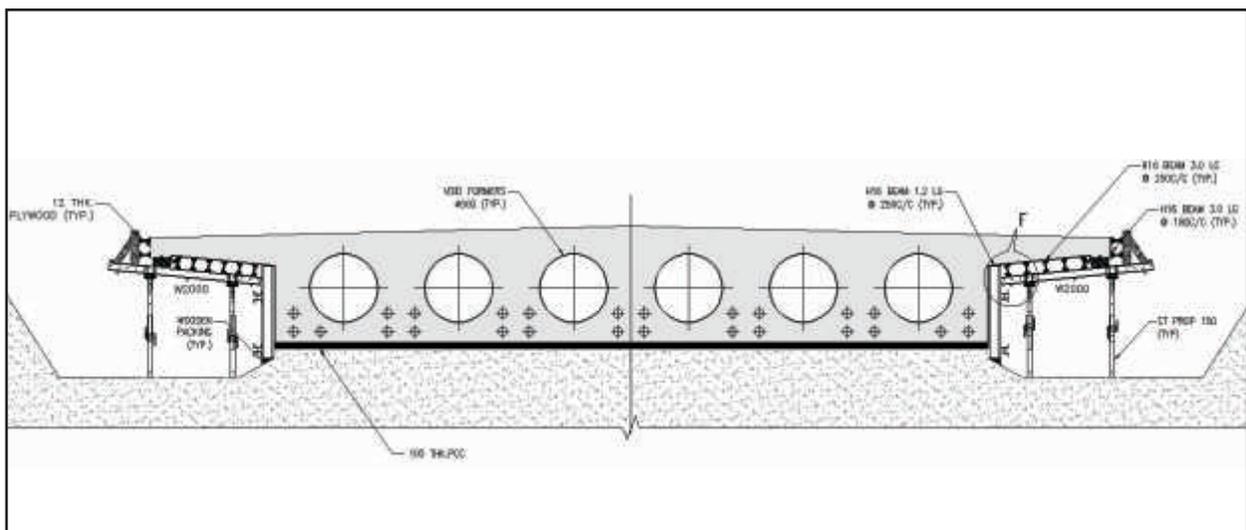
Cross section showing Bed PCC, Vertical face & Cantilever supporting
